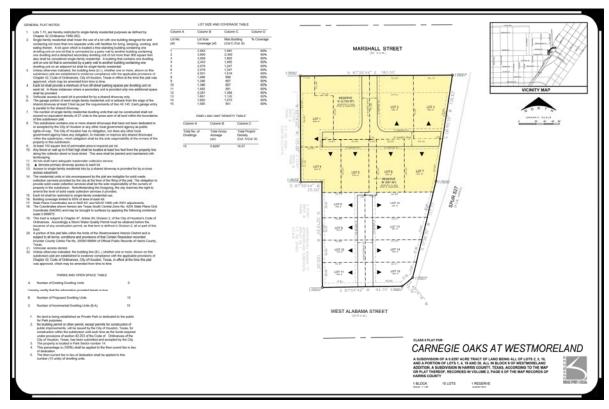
Exhibit A – Application number 2013-2040 – Section 1 of Development (highlighted). Section 2 below.
